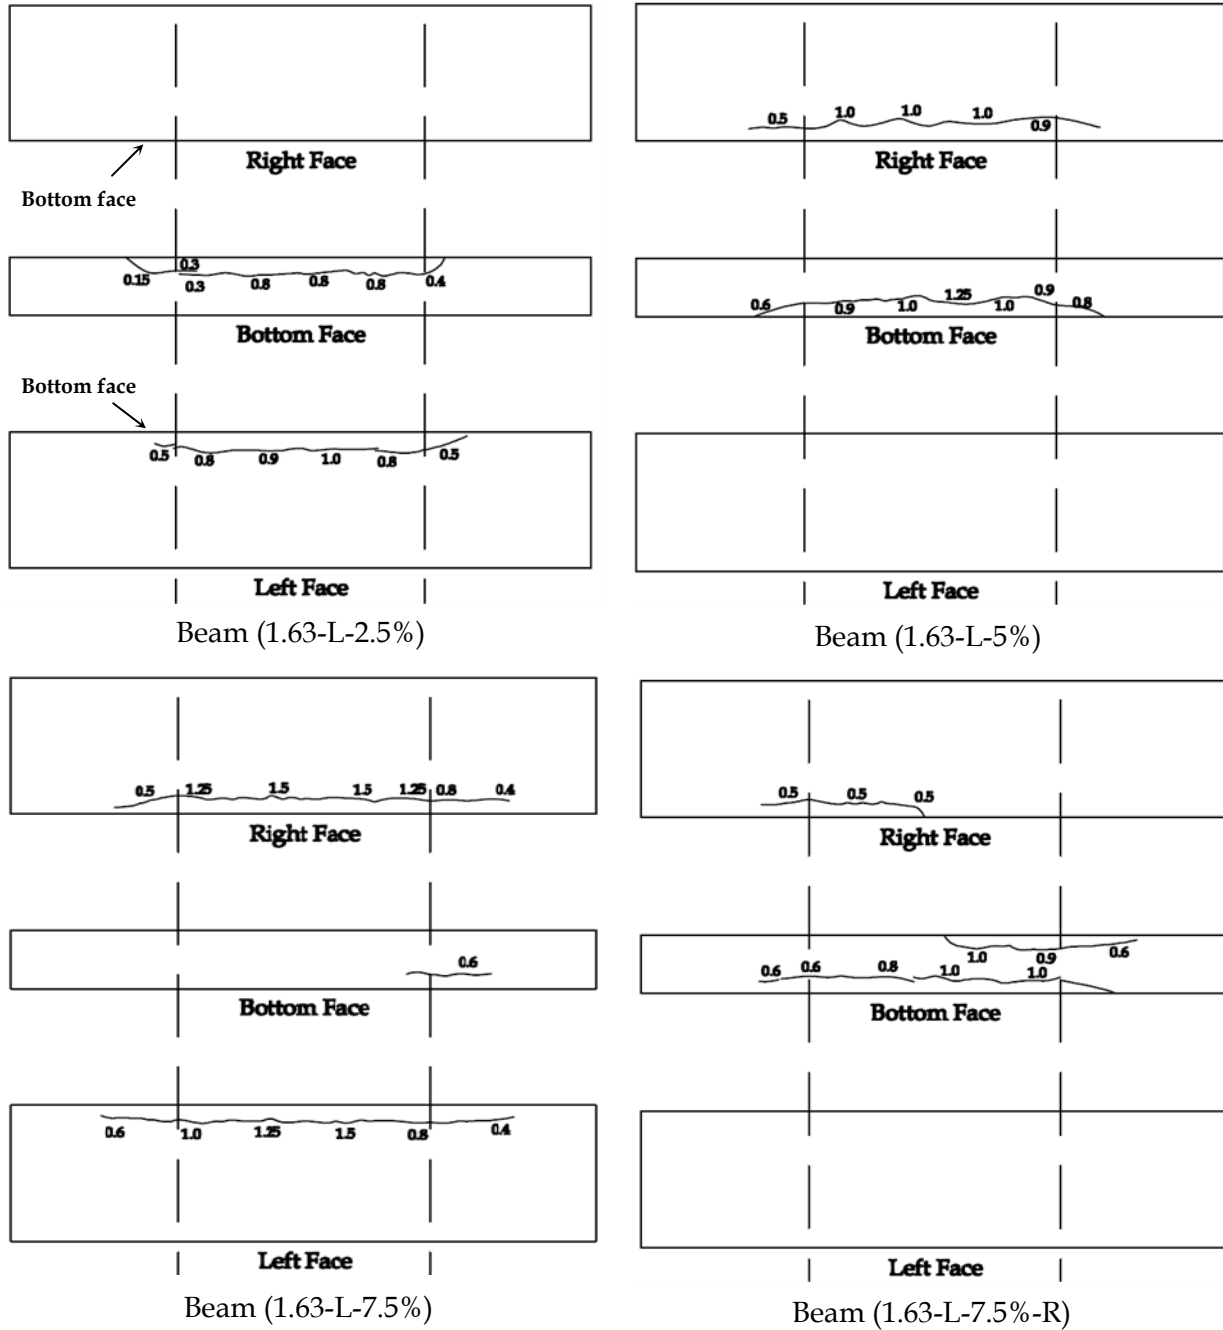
Corrosion crack patterns and crack widths of deep beams without stirrups
